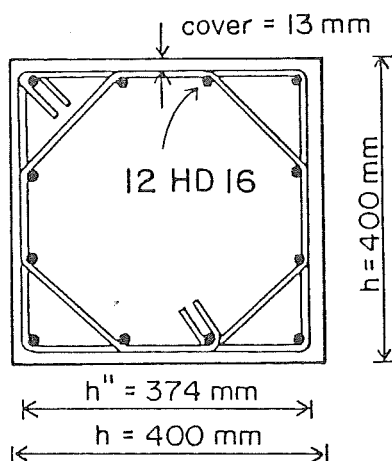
CROSS SECTION OF COLUMN UNITS
